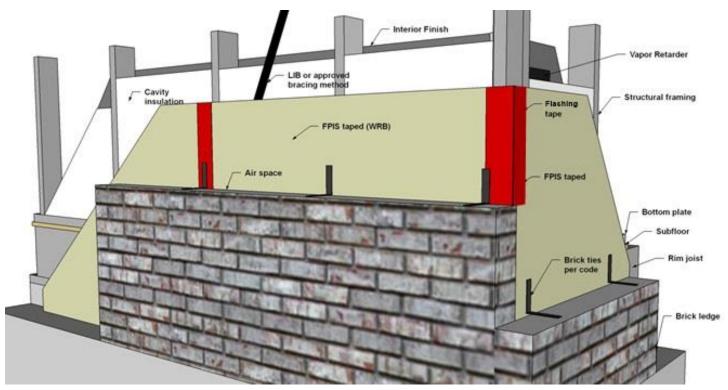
Wood-Frame Wall with LIB and Exterior Finish of FPIS as WRB and Brick Veneer (anchored and separately supported)
